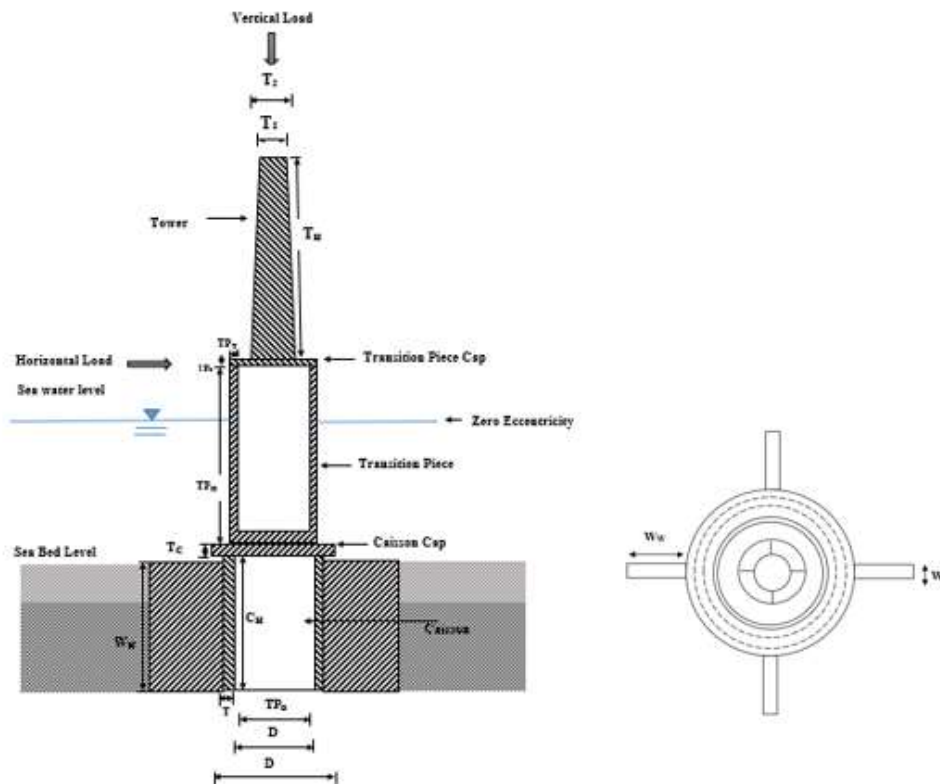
Cross Section and Plan of Hybrid Caisson Foundation Considered for Analysis
